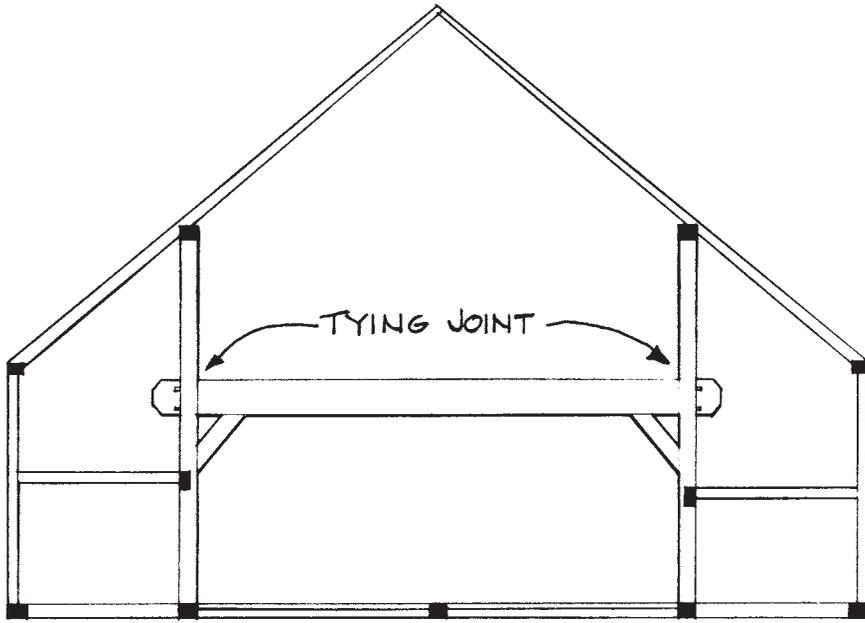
The New World Dutch barn is an aisled building. The structural core is the H-shaped bent, each composed of aisle posts and an anchorbeam with heavy braces. Because the tying joint is interior, the tenon can be extended without being exposed to the weather.
